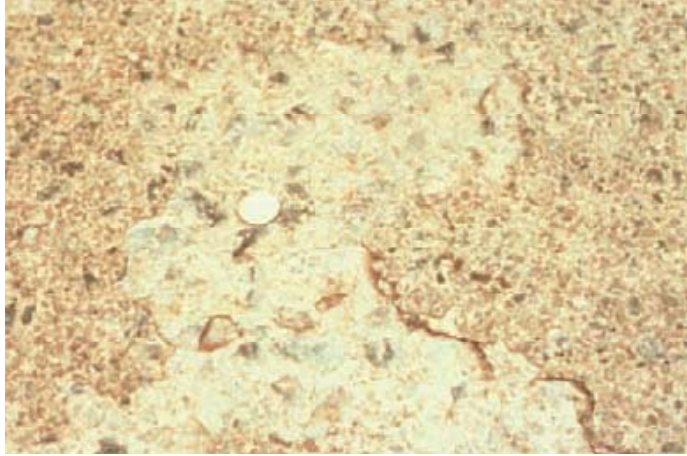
Spalling on concrete deck surface (FHWA 2006)
